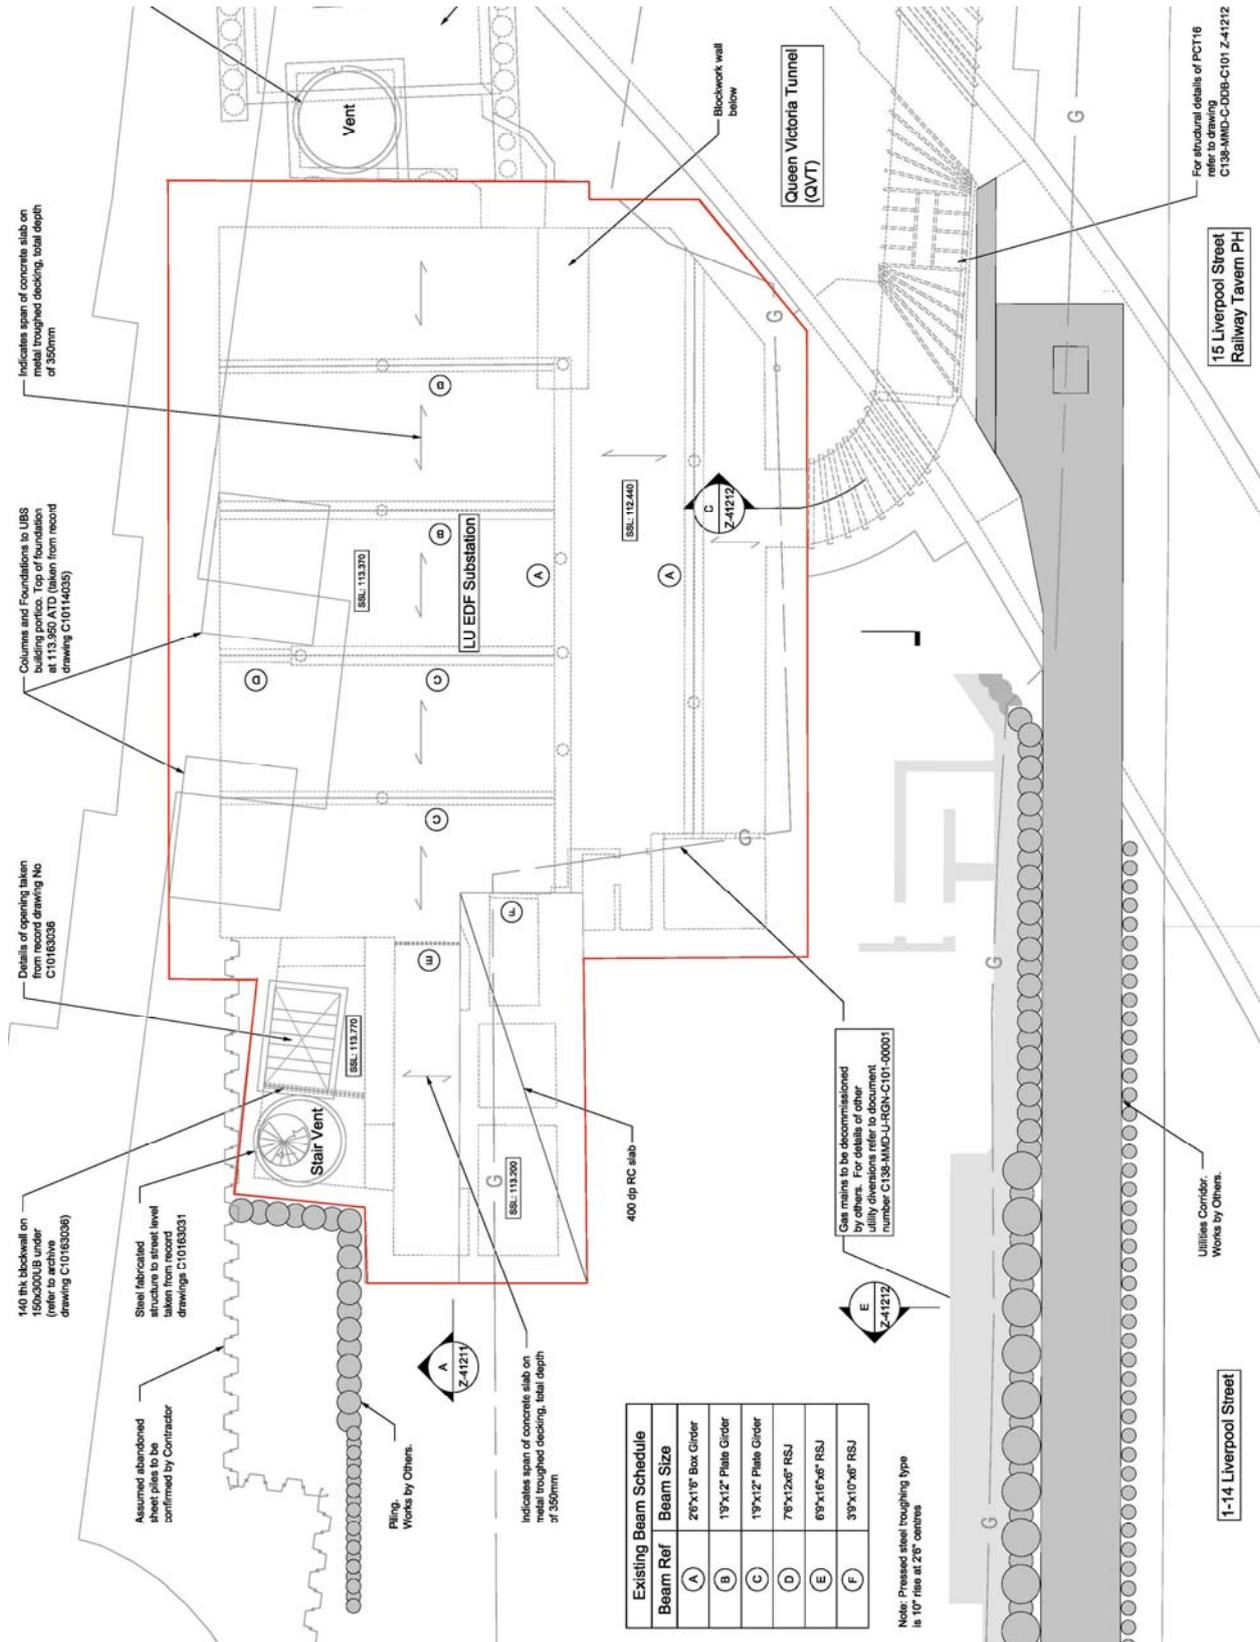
Plan of the ticket hall with construction detail (extracted from Crossrail drawing C138-MMD-C-DDA-C101_1-41051)
